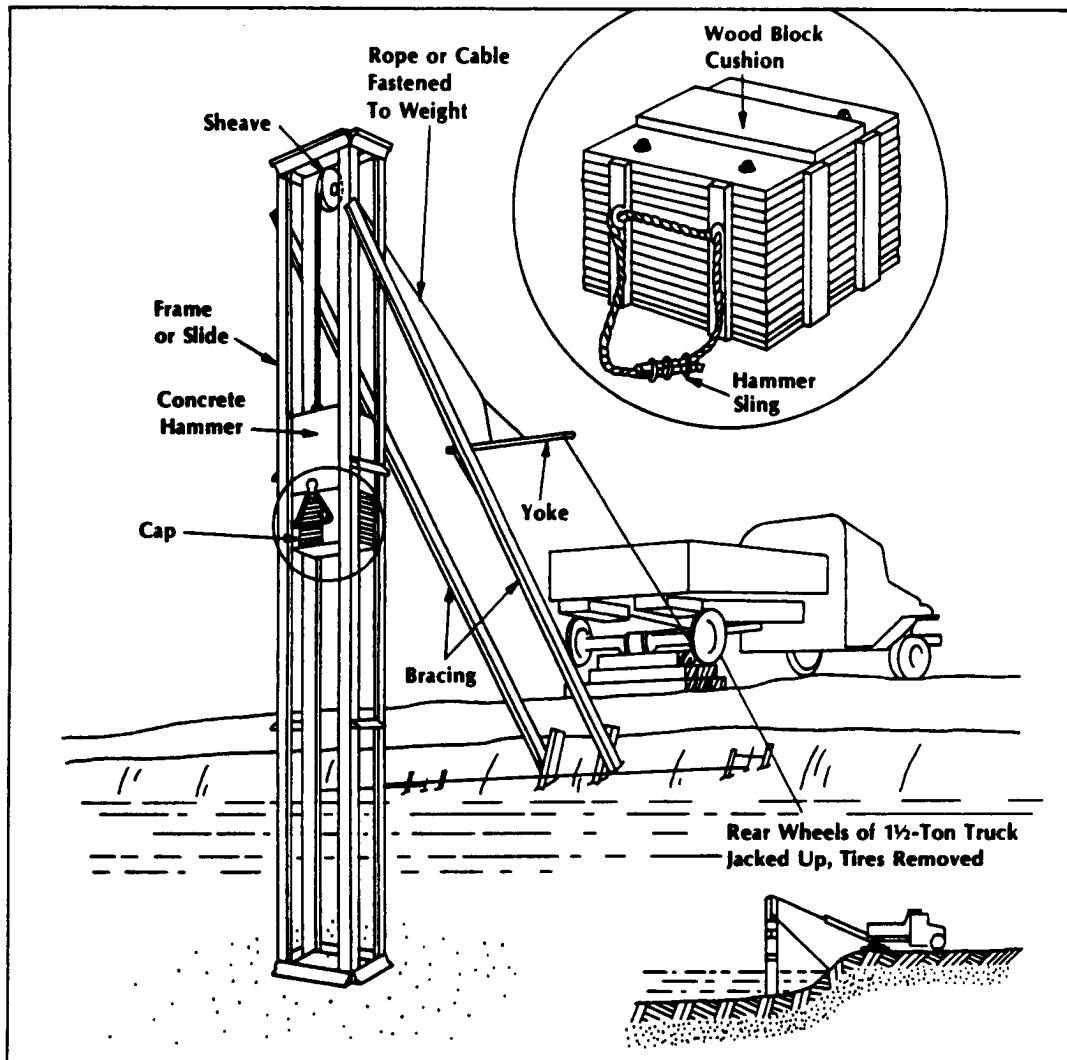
Expedient pile driver made of constructed welded steel angles
